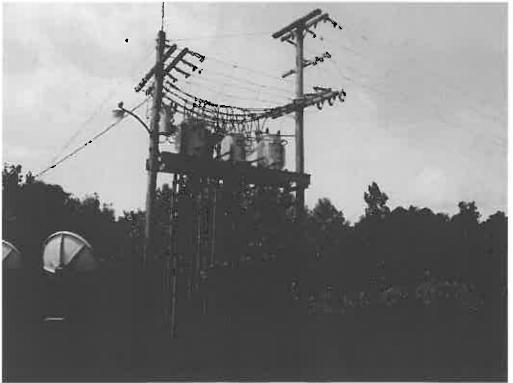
Looking southwest at electrical transformers located along the west property boundary.
